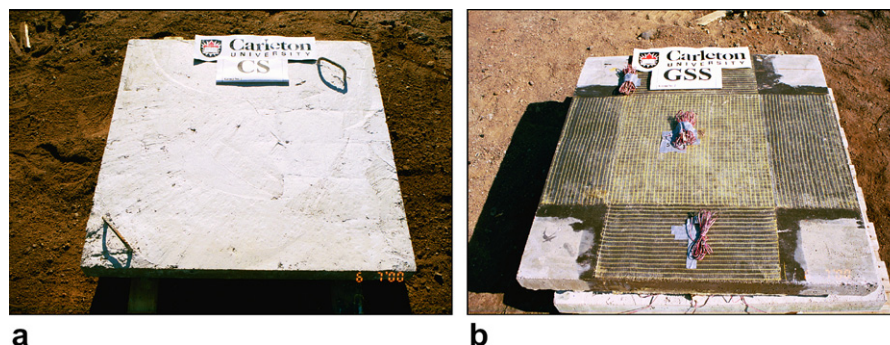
Typical test panels: (a) Control specimen; (b) retrofitted specimen.
